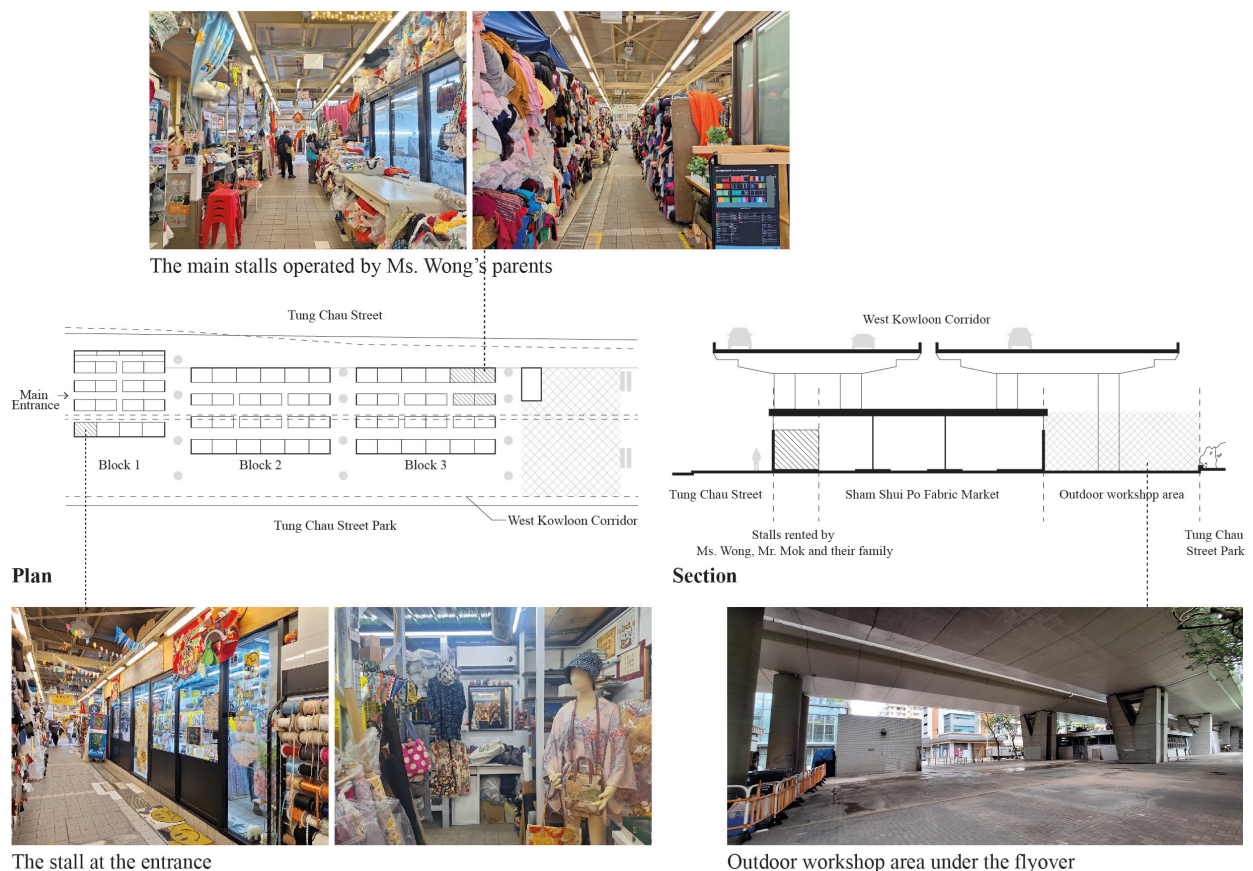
Diagrammatic plan and section showing the locations of the outdoor workshop area and the stalls rented by Ms. Wong, Mr. Mok and their family. (Source: Authors, 2025).
